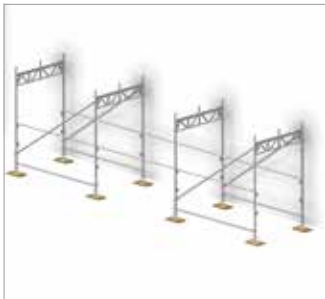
Example of a scaffold section with walk-through frame (DGR) and braces on the lowest level
